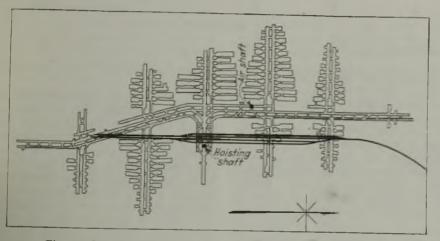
General Plan of Development, Big Chief No. 10 Mine.
